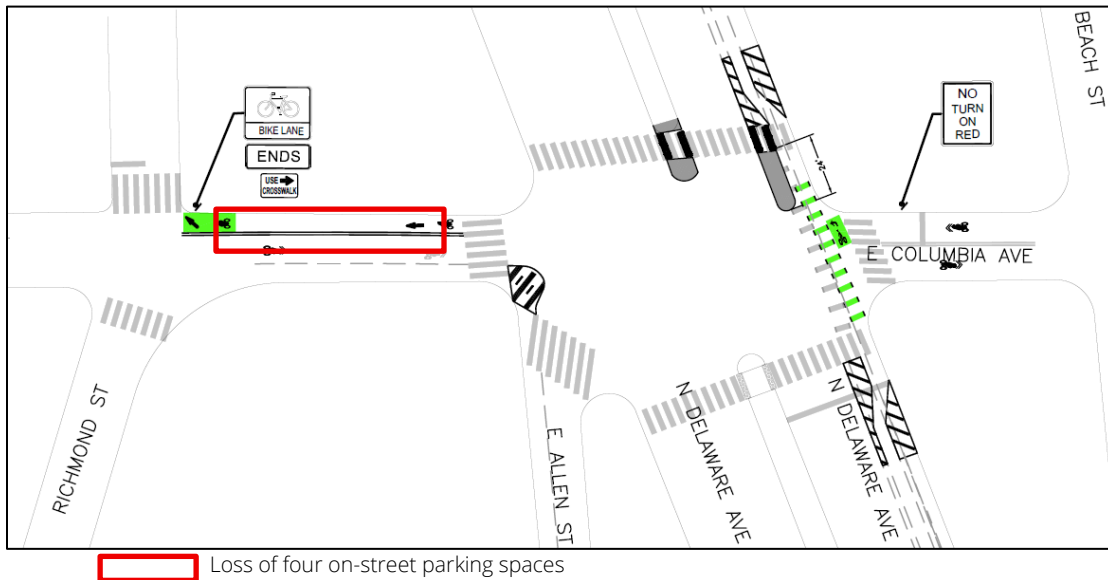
Draft Design of Westbound Route A on Columbia Avenue (Richmond Street to Beach Street)
